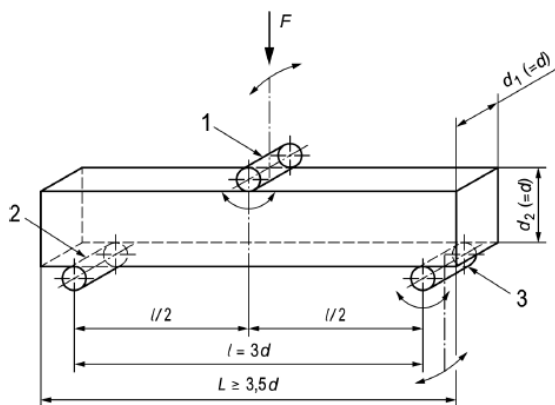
6: Illustration for locating the beam on test machine.[67]
